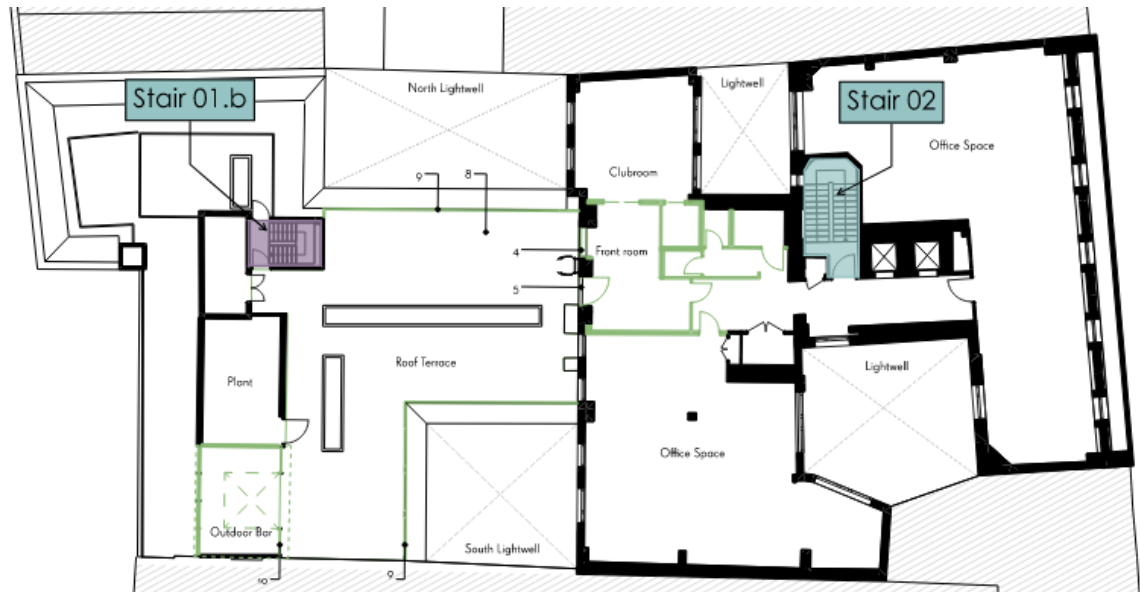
Proposed fourth floor plan (external terrace and office areas).
